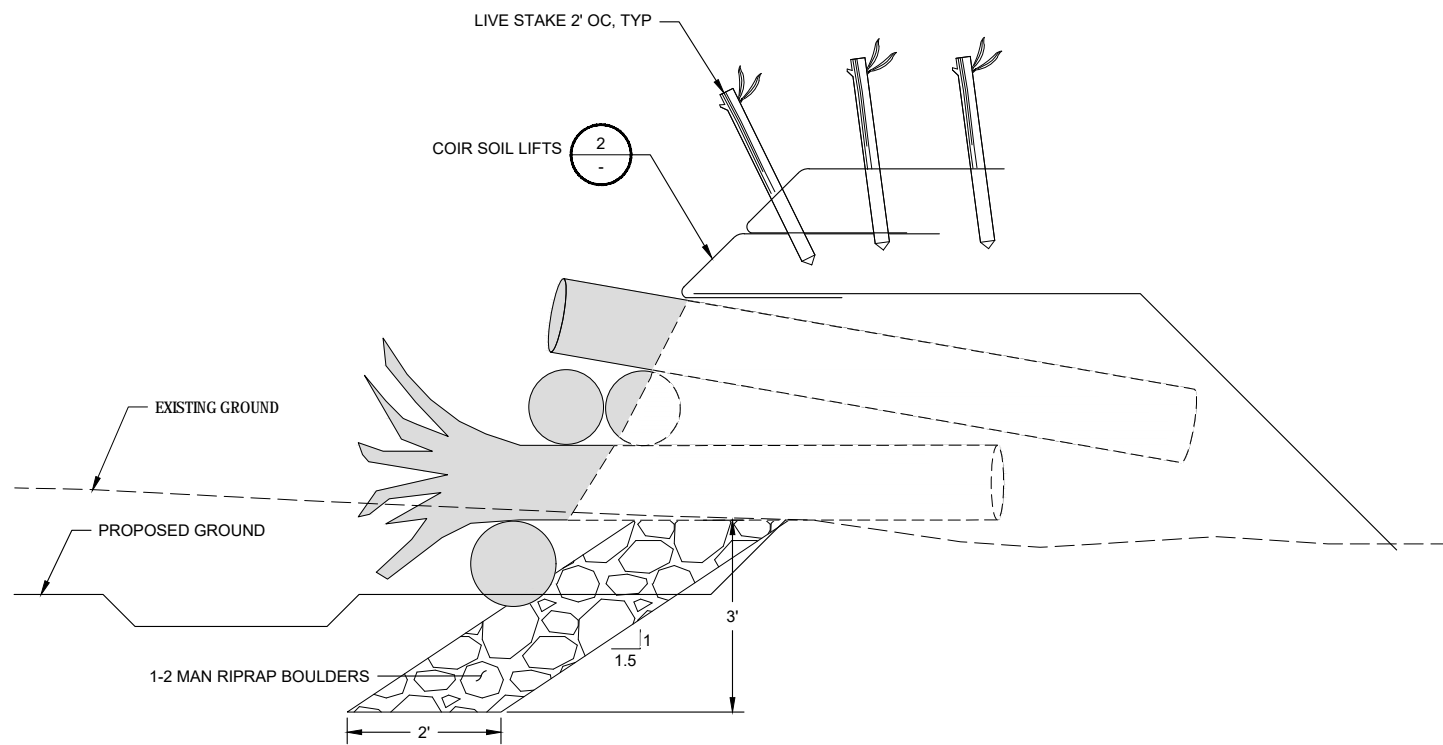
DETAIL - TYPICAL COIR SOIL LIFT EMBANKMENT
